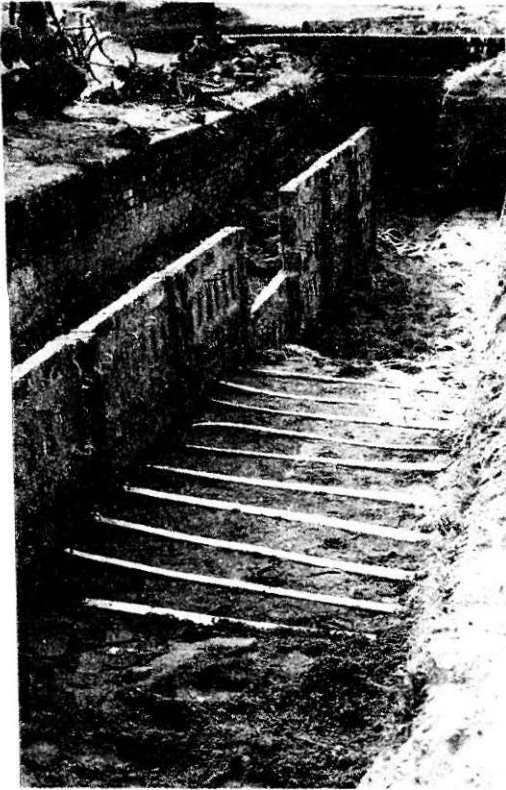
View of Reinforced Earth Wall Showing Laying of Reinforcing Strips in Position
